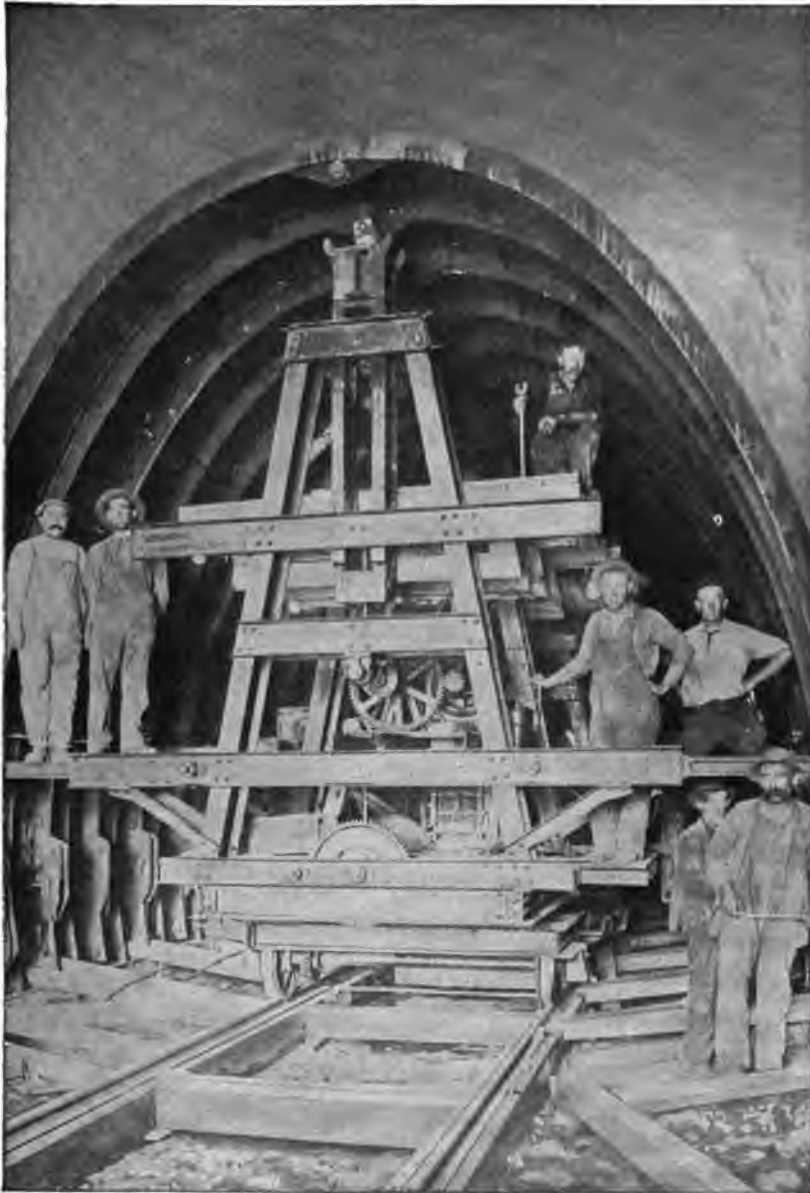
Contract 11. Electric Carriage for Moving Interior Forms for Cut-and-cover Aqueduct. Carriage and Upper Jacks are Motor Driven. Side Jacks and Turntable Hand Driven.
